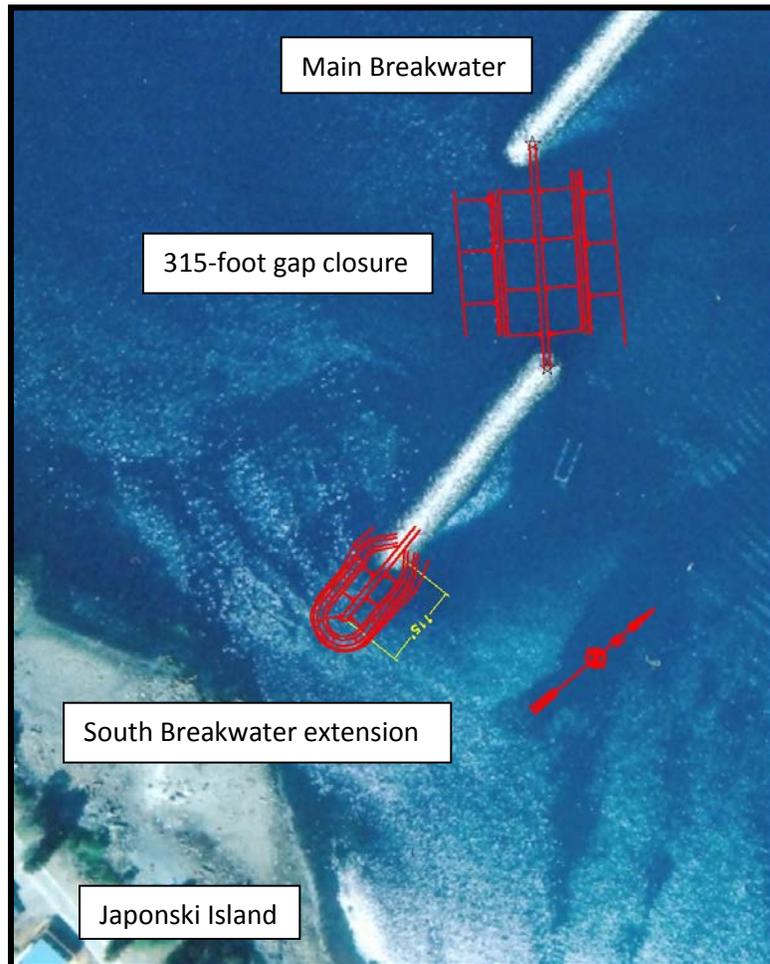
Linear extension off the south breakwater towards Japonski Island. Also shown is the previously approved (but not yet constructed) 315-foot closure between the main and south breakwaters.
